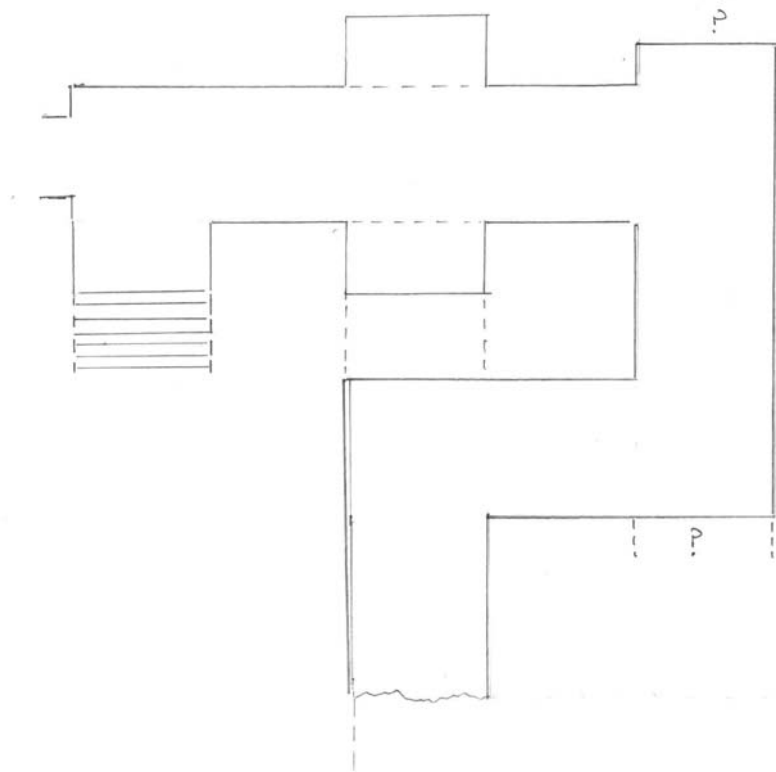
Sketch showing first section of the air raid shelter. The dashed lines indicate blocked openings. The steps lead up into the colliery buildings. North is to the top of the sketch
